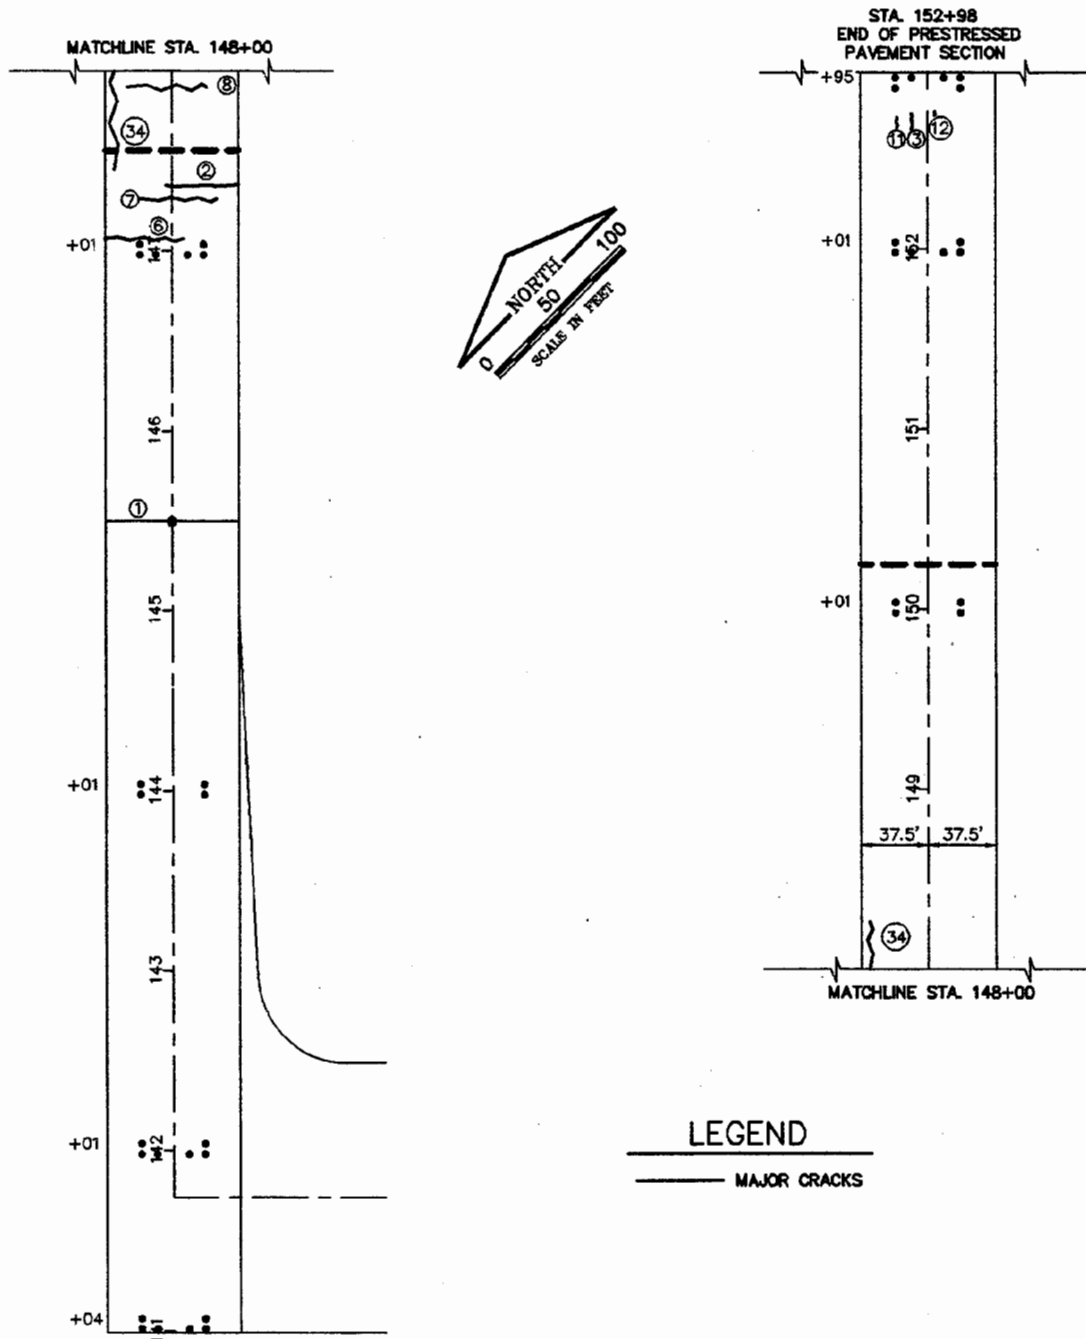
MAJOR CRACKS IN THE PRESTRESSED CONCRETE PAVEMENT, SUMMER 1998
